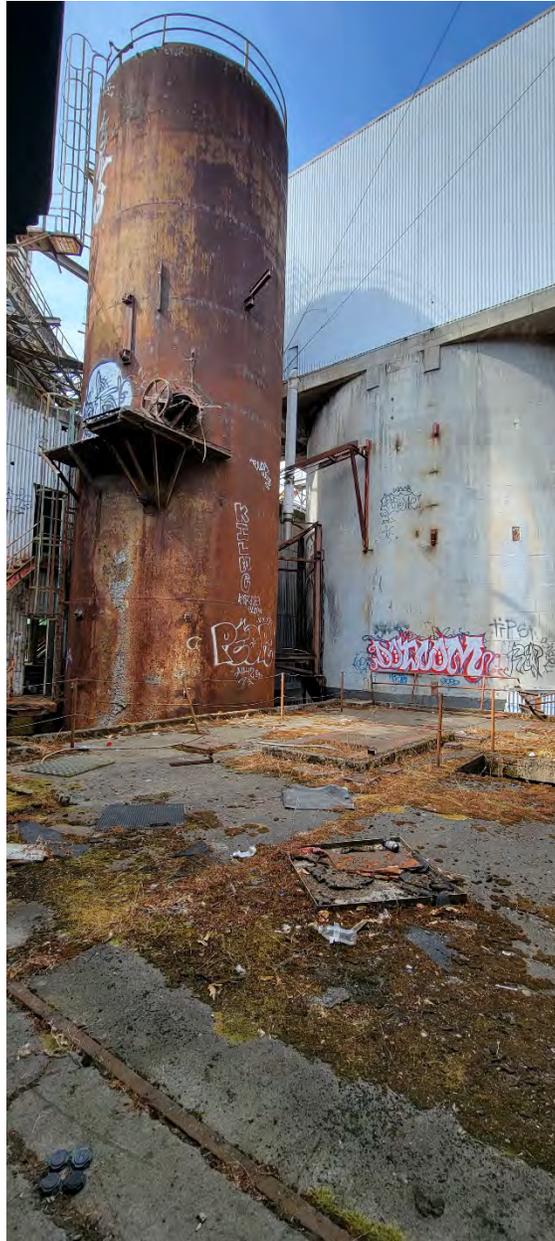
East of Boiler Plant Building 29-approximately 60-foot-tall steel tank (ID 29-A-220921-1)
